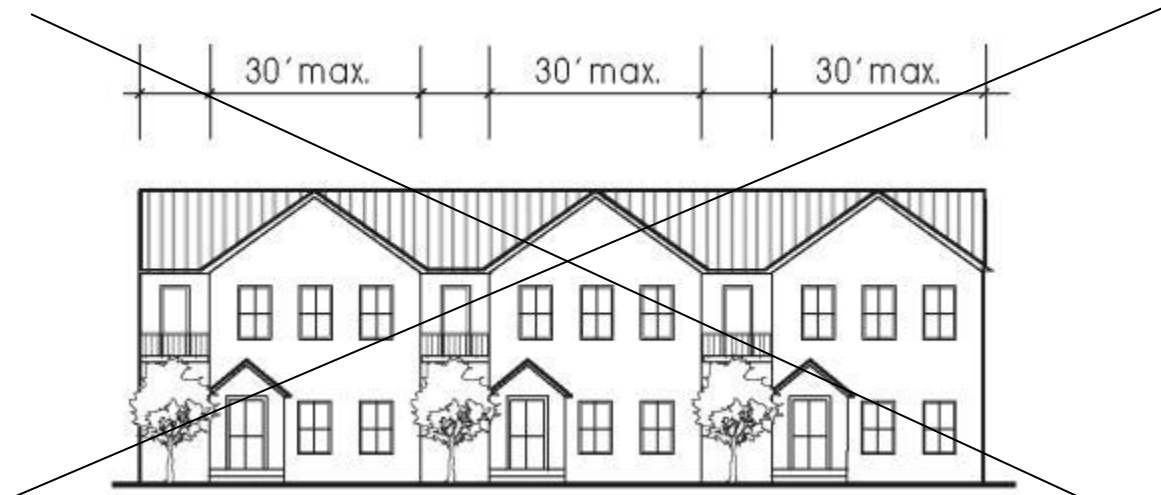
(D): Example of articulation of facades that can help break down the scale of large buildings.
